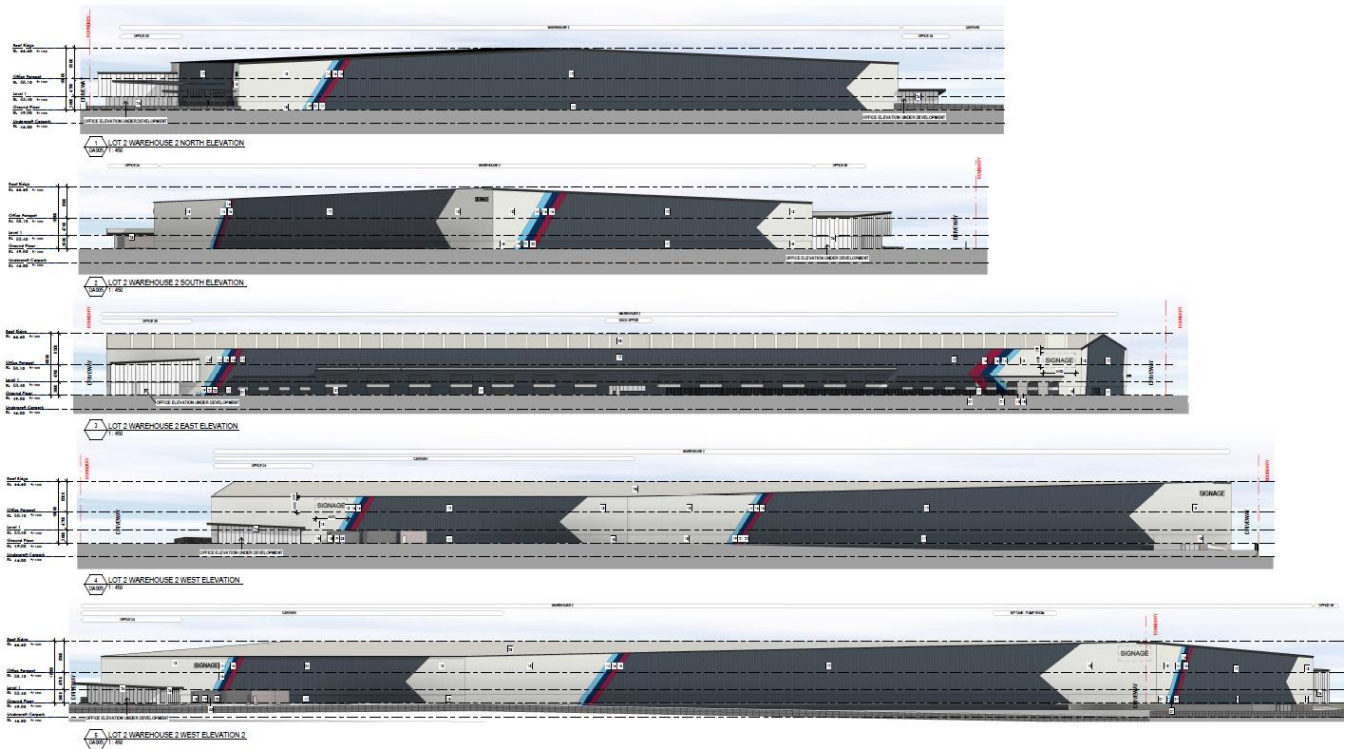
WAREHOUSE 2 ELEVATIONS
